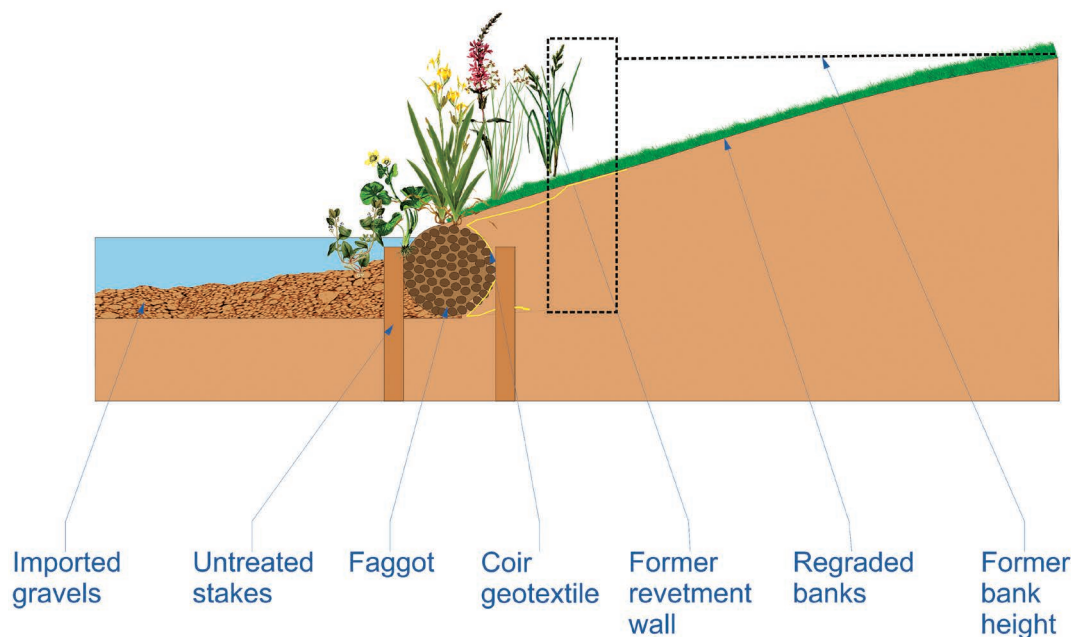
Bank softening at Hackbridge (courtesy South East Rivers Trust)
